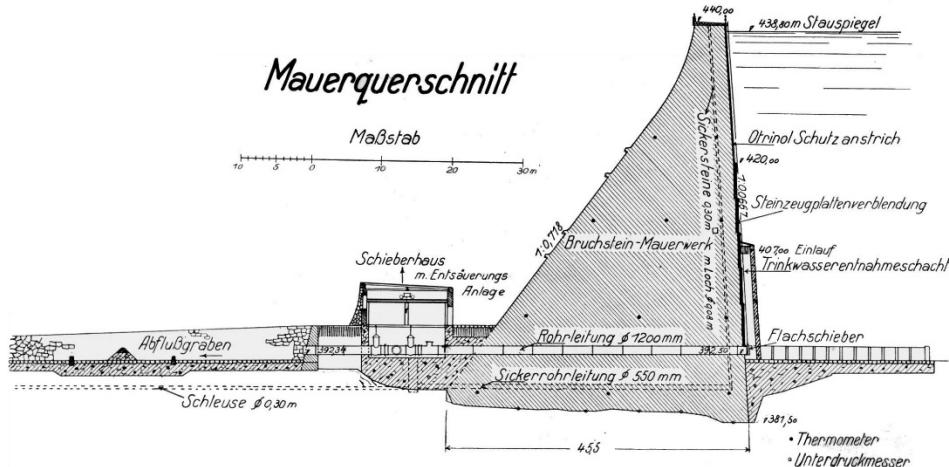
Cross section of the dam wall (Rat der Stadt Chemnitz, 1933)
